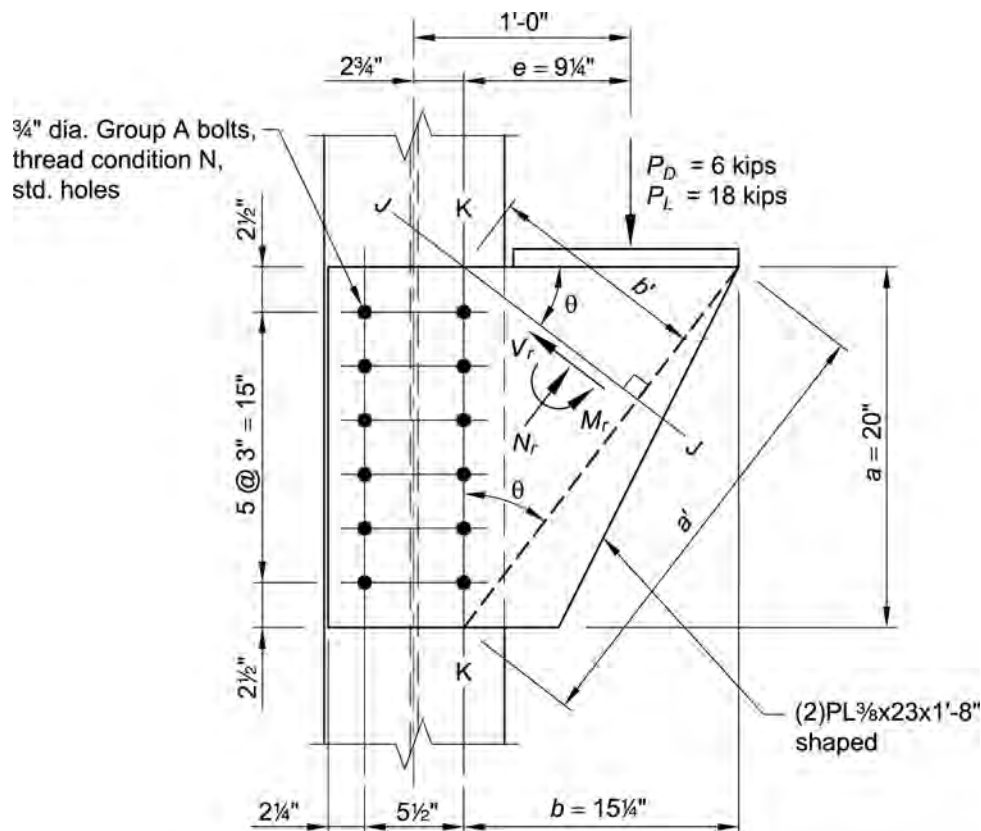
Connection geometry for Example II.A-22.
